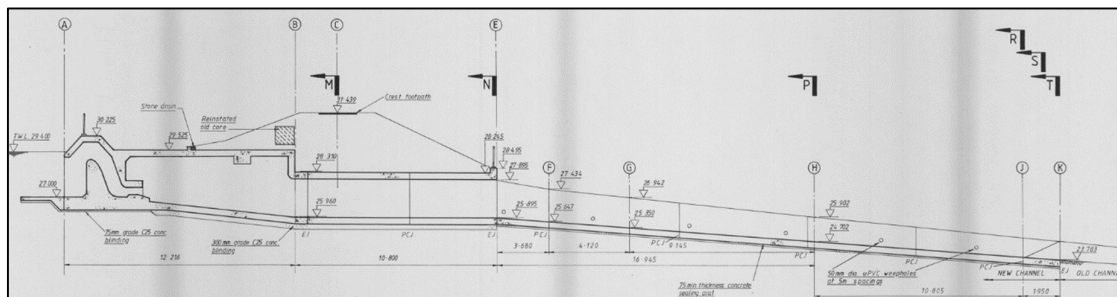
Longitudinal section through 1985 siphon spillway and downstream channel
